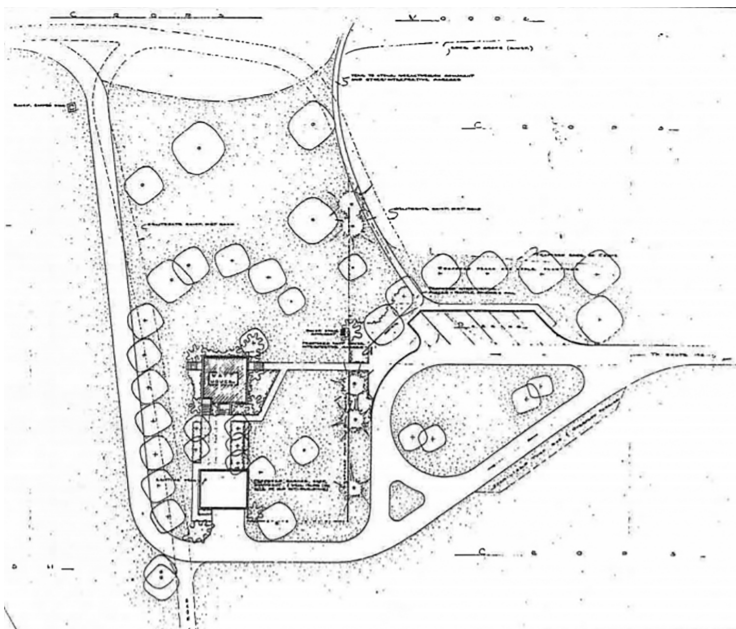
Development plan for the Watt house, 1958. This drawing shows a proposed garage on the location of an earlier outbuilding. Proposed plantings include peach and apple trees immediately west of the proposed diagonal parking. (RICH Archives, Drawing 367-2022)
